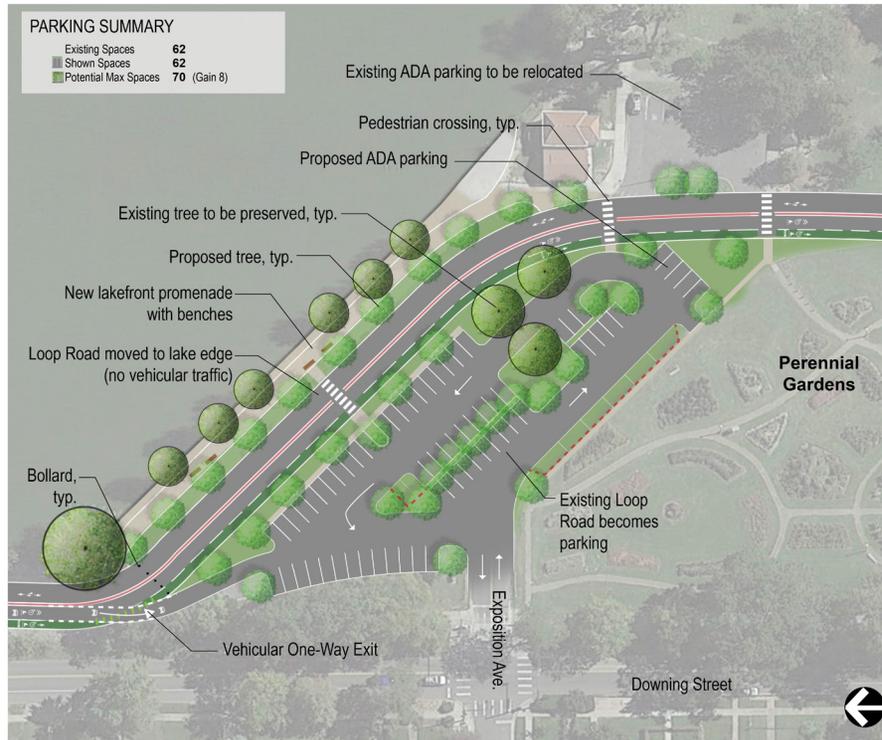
Recommended Improvement Concept: Exposition Avenue Parking Lot
